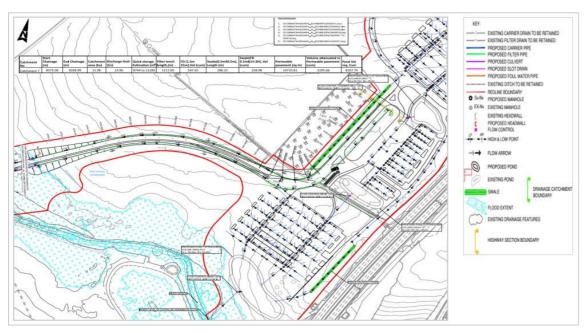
Proposed ponds 5.6 & 7 – layout and discharge location
